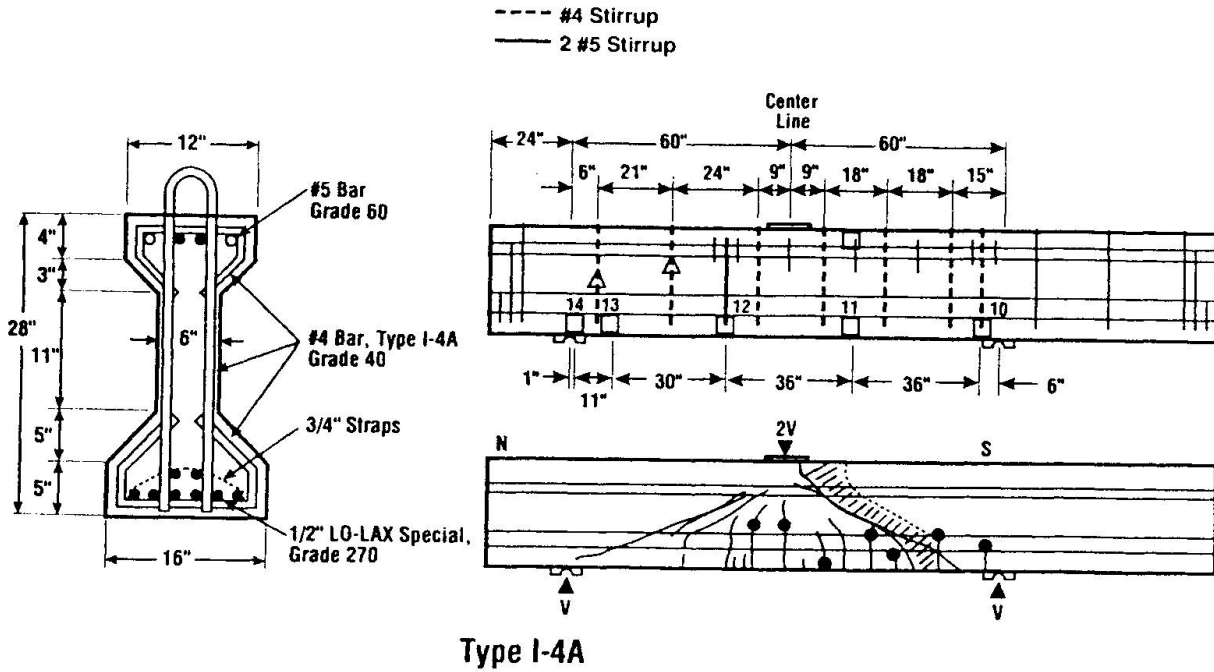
Detailing and Failure Crack Pattern of I-4A.
